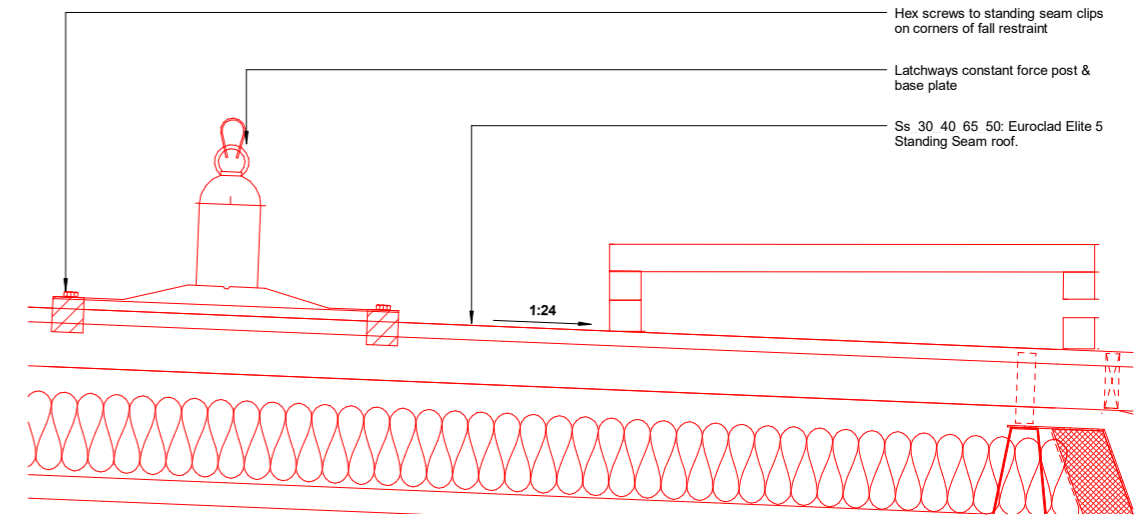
Proposed Roof Access Walkway and Fall Restraint System
